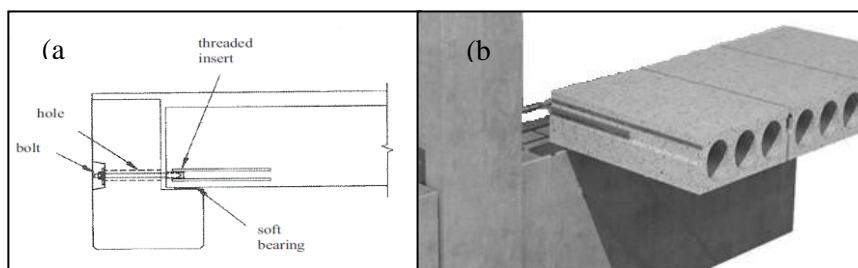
Beam-to-slab connection at the edge of the structure (Mishra 2012)
